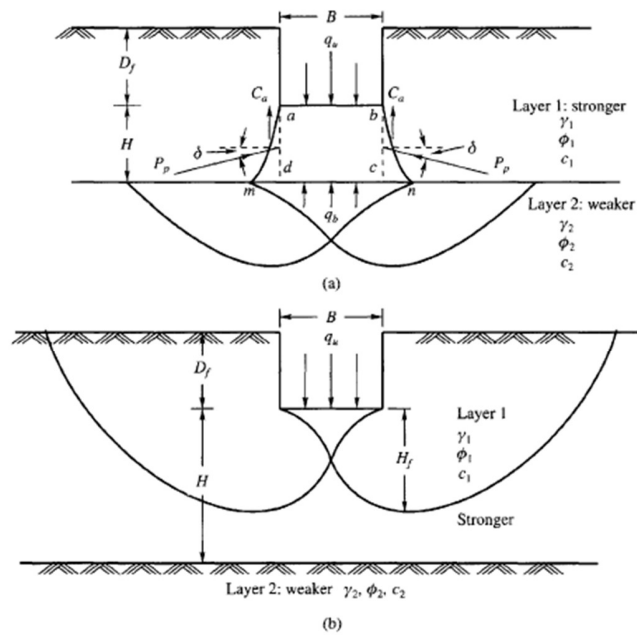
Failure of soil below strip footing under vertical load on strong layer overlying weak deposit (after Meyerhof and Hanna, 1978)
